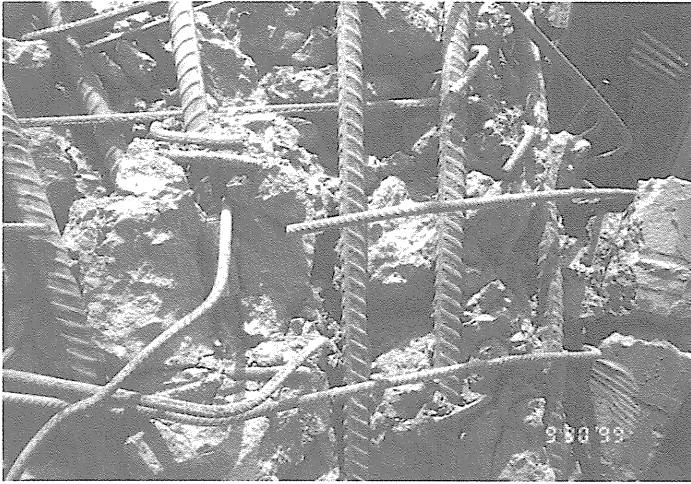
Typical deficient column details: ties with 90-degree hooks instead of 135-degree hooks, excessive spacing of ties, and inadequate transverse cross ties. (Photo: Amin)
